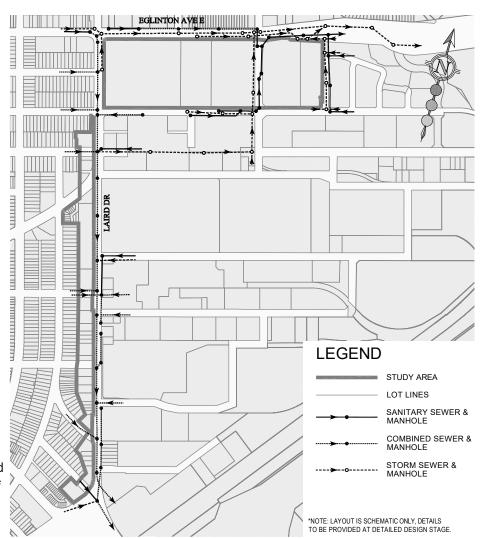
General infrastructure plan indicating existing location of sanitary, storm, and combined sewers
